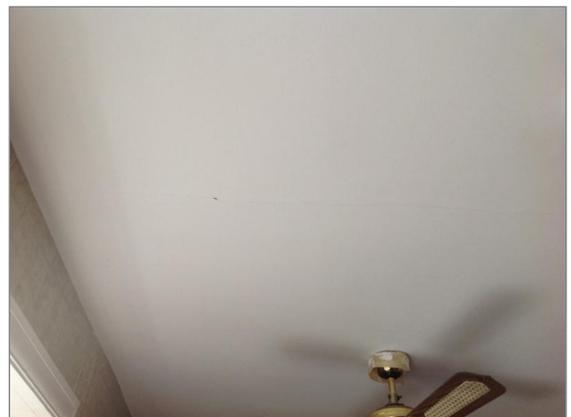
Hairline cracking to joints of plasterboard of kitchen ceiling
